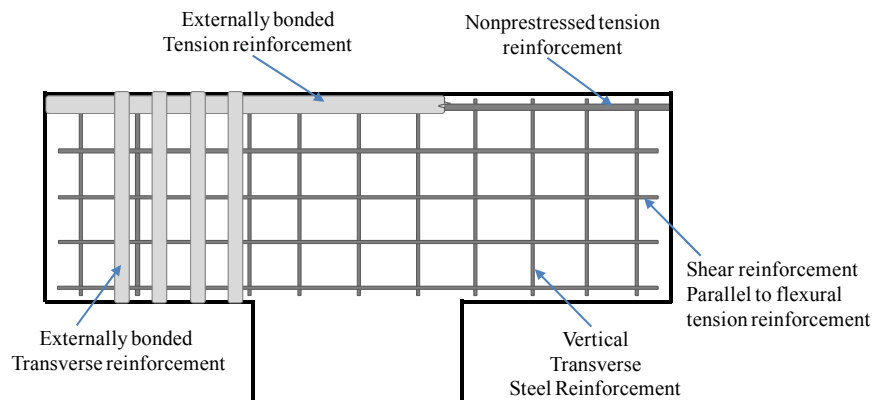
Details of a reinforced concrete pier cap with externally bonded reinforcement system
